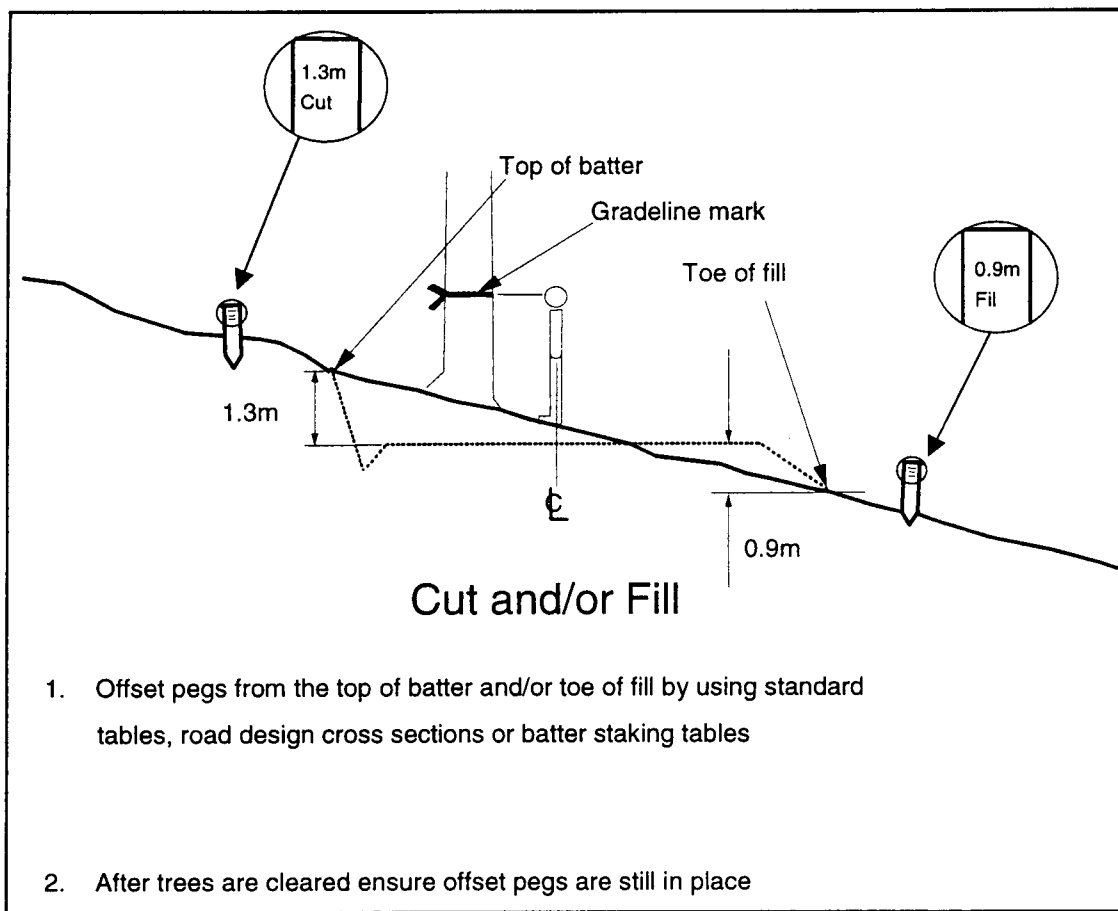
Setout information for road cross-section with a side slope of 60%.
